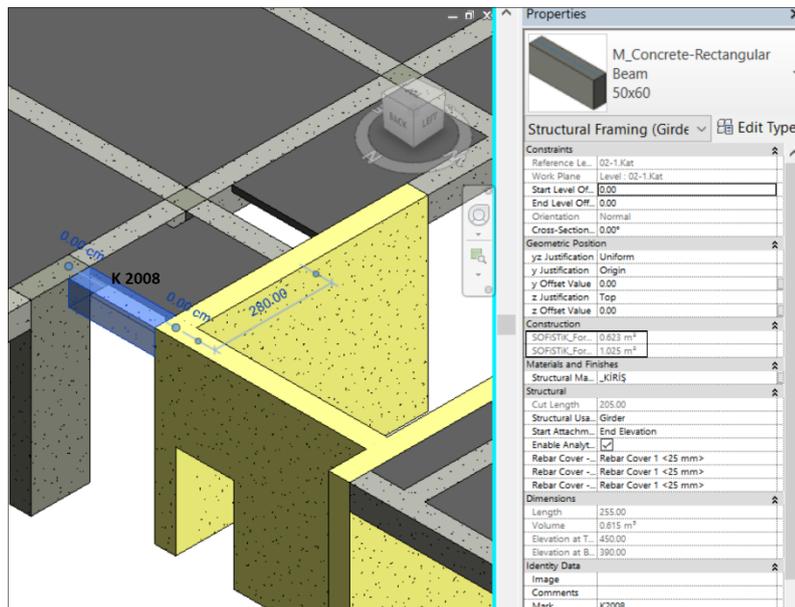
Beam Joining with Structural Wall in Revit Model
